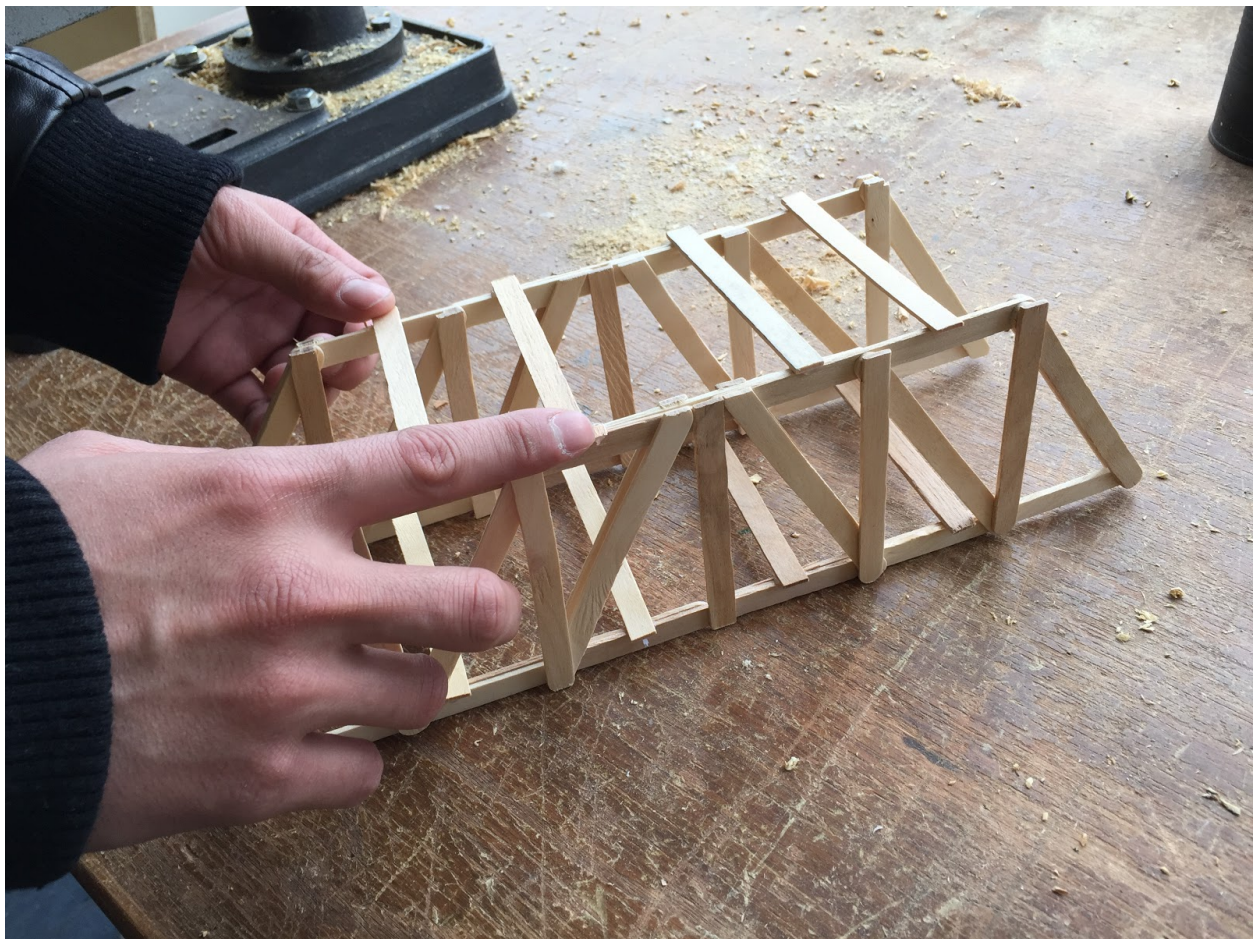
Howe Truss Bridge Prototype Failure after Load Testing
